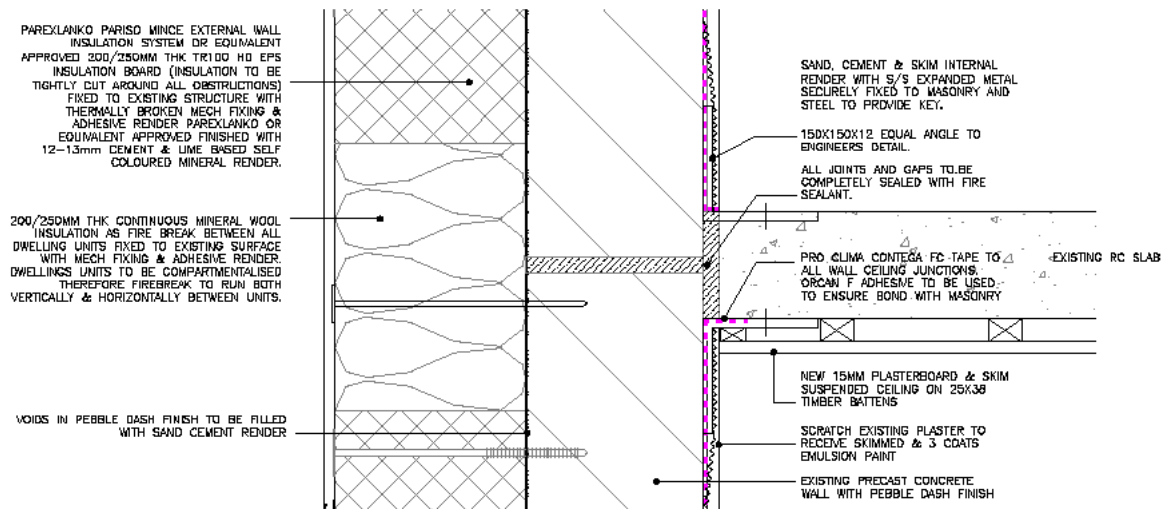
Wall floor slab junction (not to scale) [DLR Co. Co., 2014]
